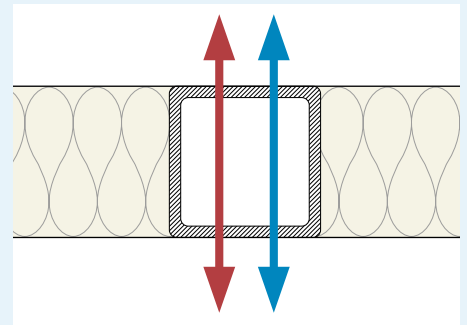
Schematic diagram of structural thermal bridges caused by materials. A steel support conducts the heat out of the building faster than the insulated compartment.
